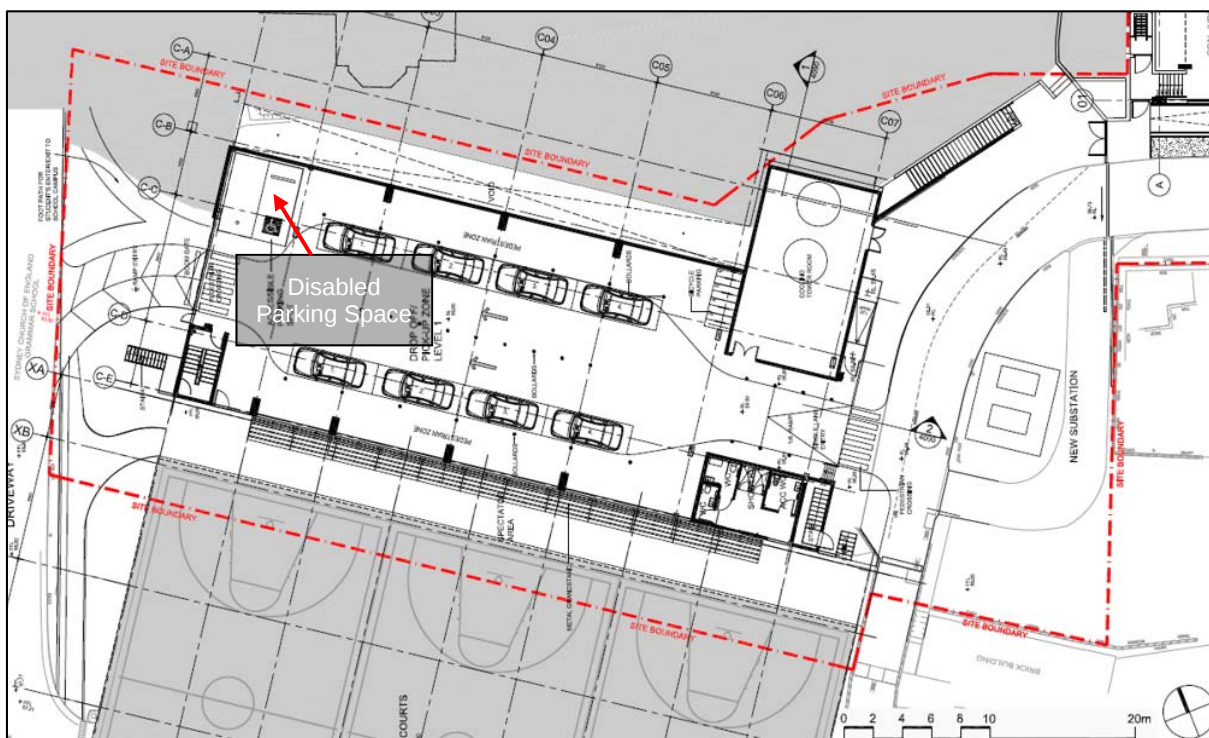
Proposed Bishopsgate Carpark first floor extension (1 space) (Source EIS)
